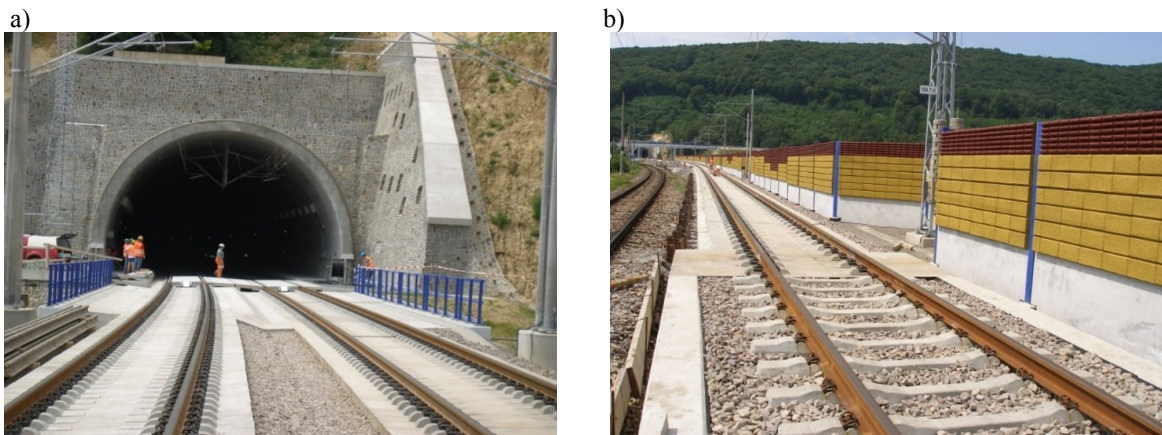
a) Ballast-less track in the tunnel b) Transient section between ballast-less and traditional track construction.
